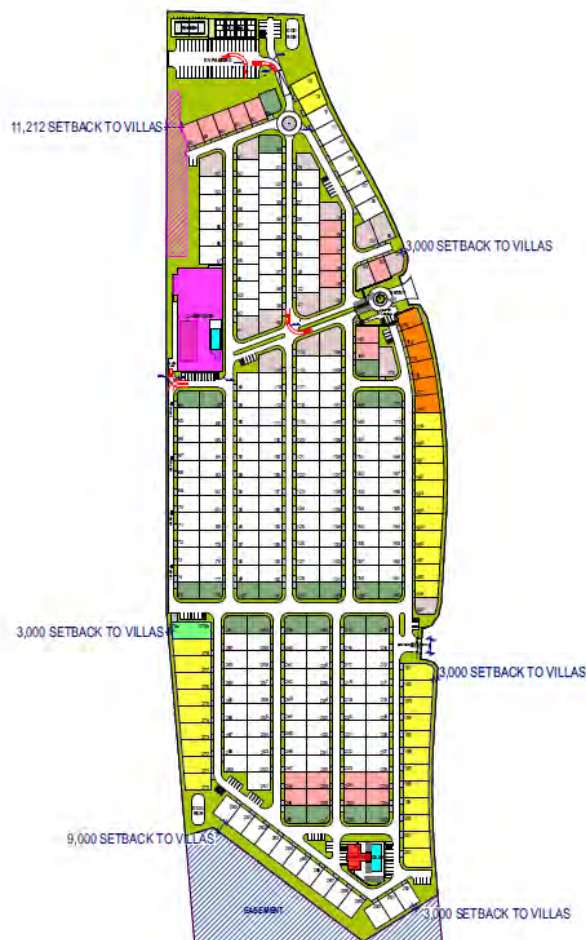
Proposed Manufactured Home Site Development Layout Plan
